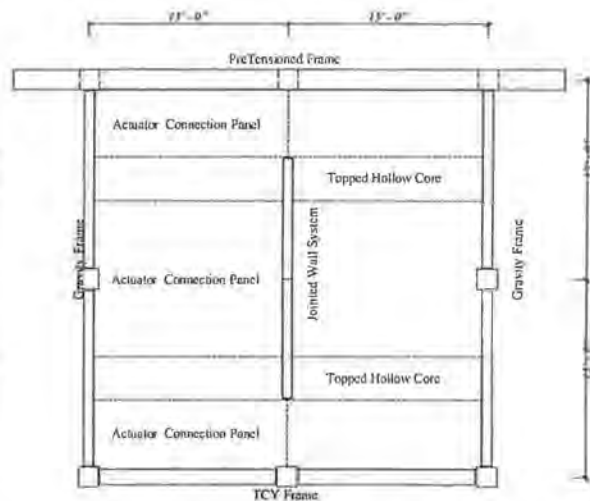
Floor plan of the test building at Levels 4 & 5.
